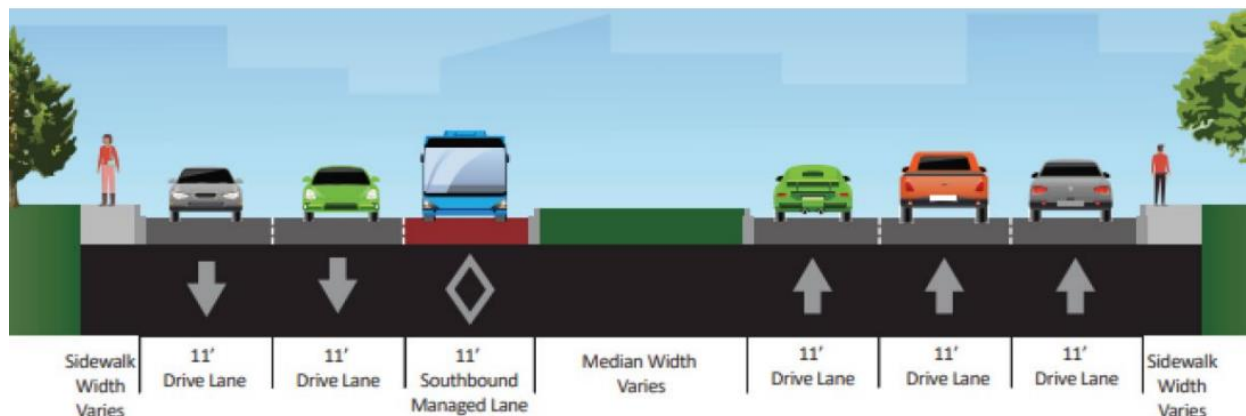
Managed Lane Alternative Cross Section, from New Hampshire Ave (MD 650) to Southwood Avenue (AM Peak Period).
